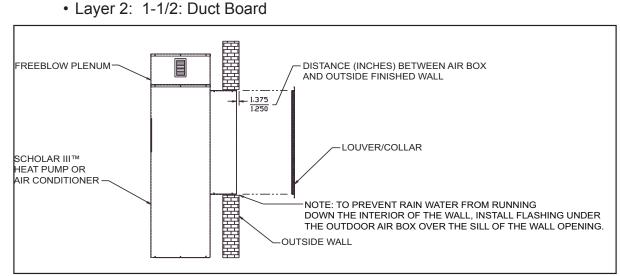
Dimension Between Scholar 2.0 Heat Pump or Air Conditioner Air Box and Finished Outside Wall for Outdoor Louver/Collar Assembly Installation
